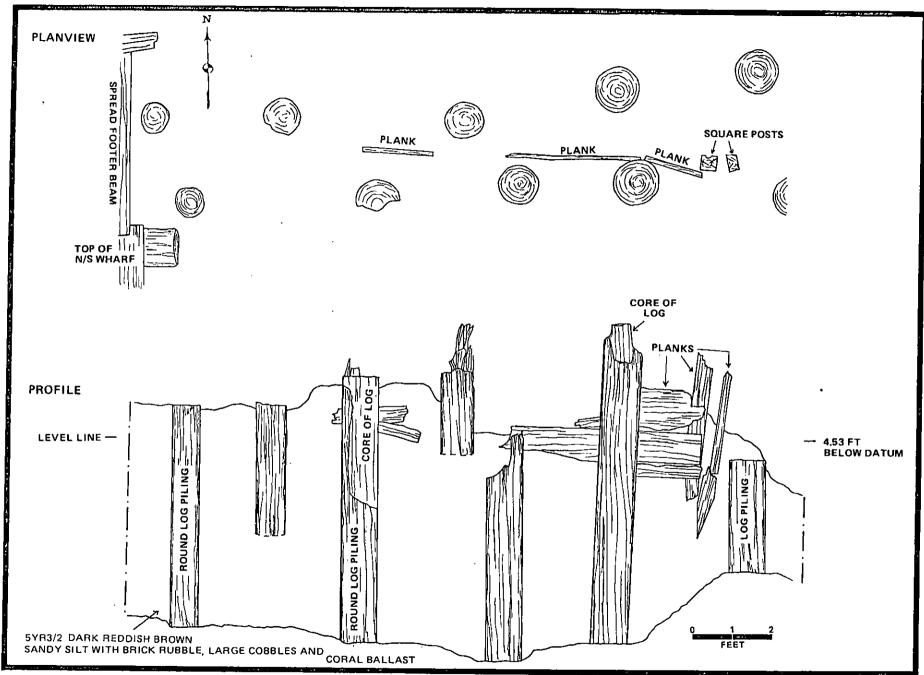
Profile and Planview of Bulkhead in Lots 8/9.
